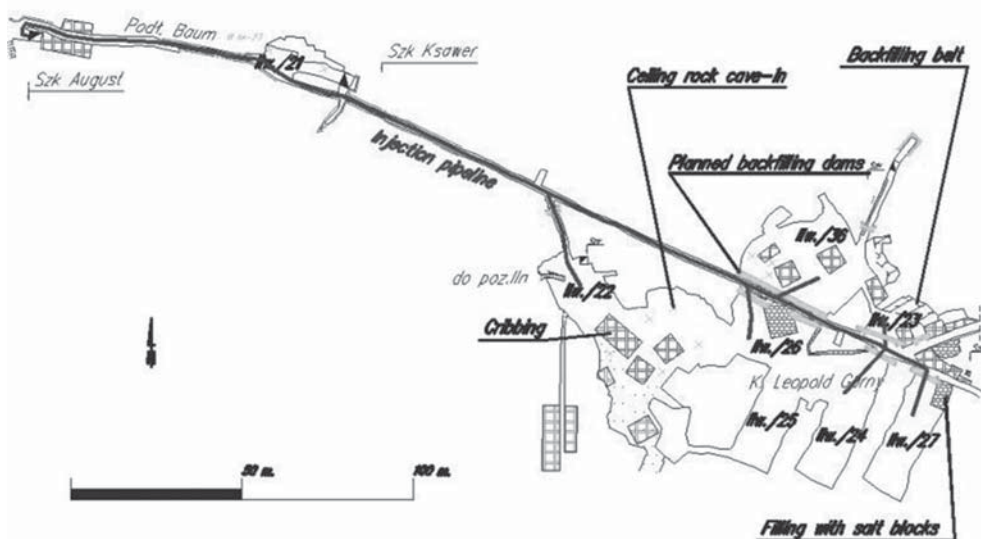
Ksawer Chambers area at Upper Level II planned for backfilling in the first stage
